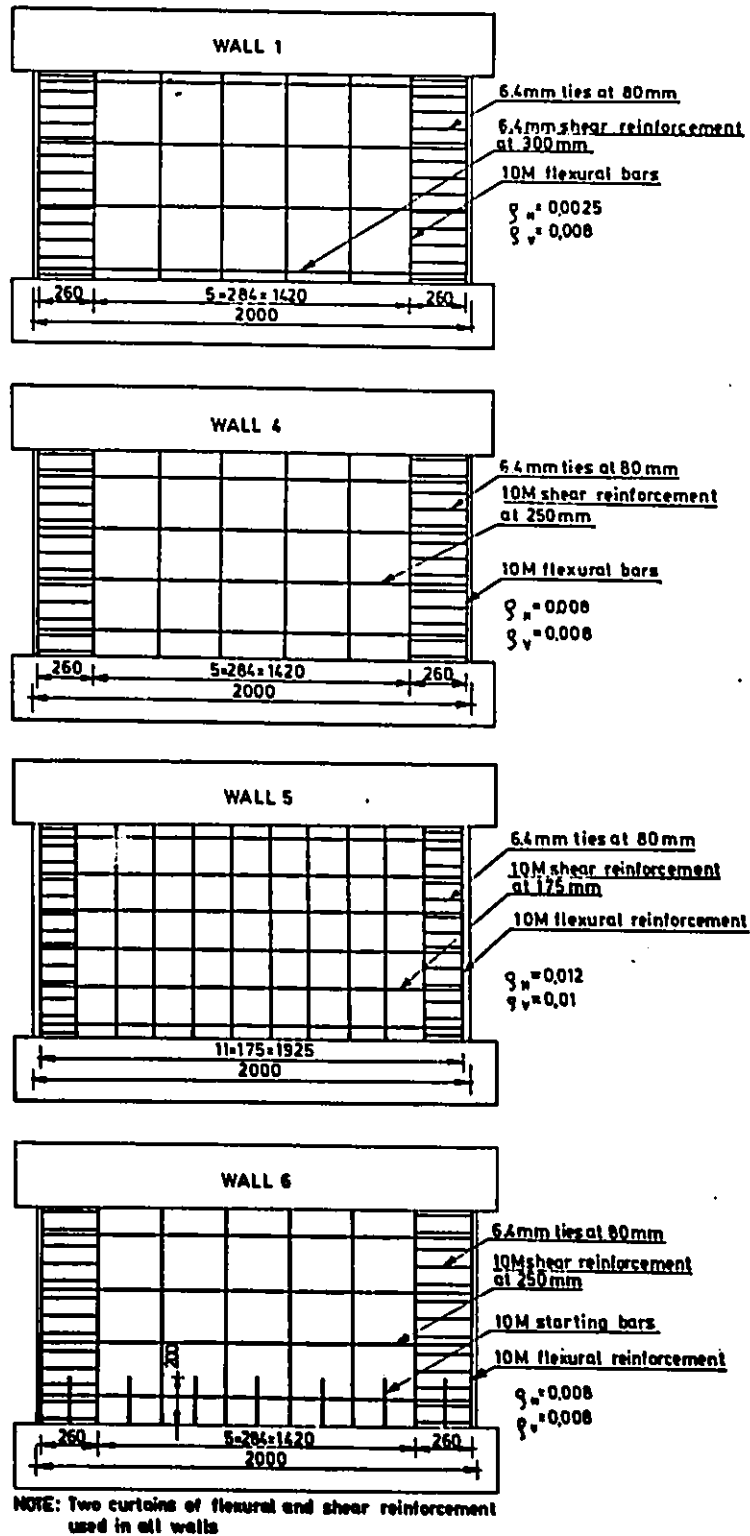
Reinforcement layout in Walls 1, 4, 5, and 6
